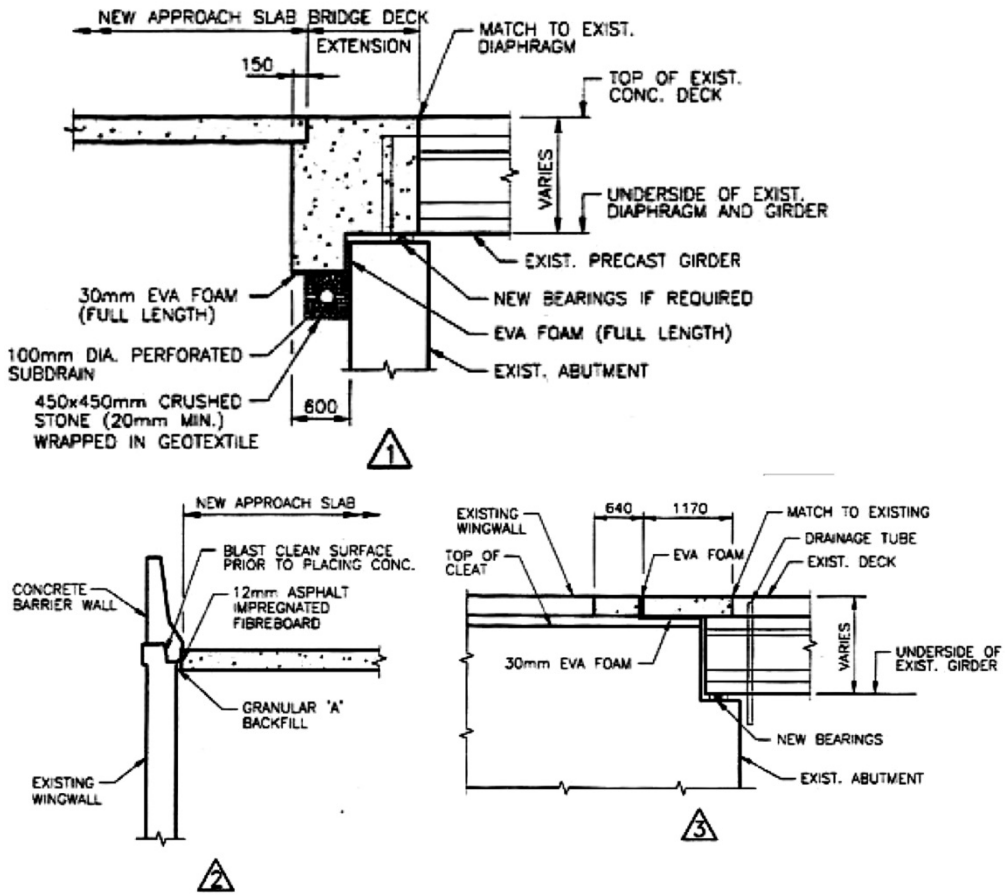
Semi-integral abutment configuration: CPCI girder with concrete deck and end diaphragm (expansion length less than 50m) (Husain, 2004)
